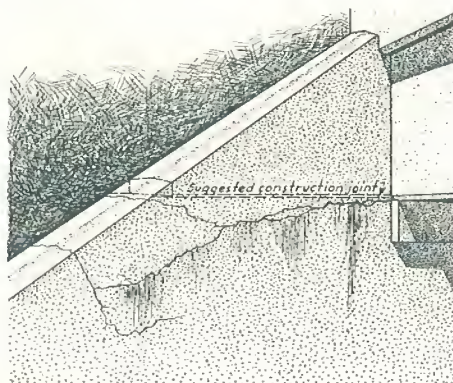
The cracks in this type of abutment may be avoided by use of a construction joint as indicated.
